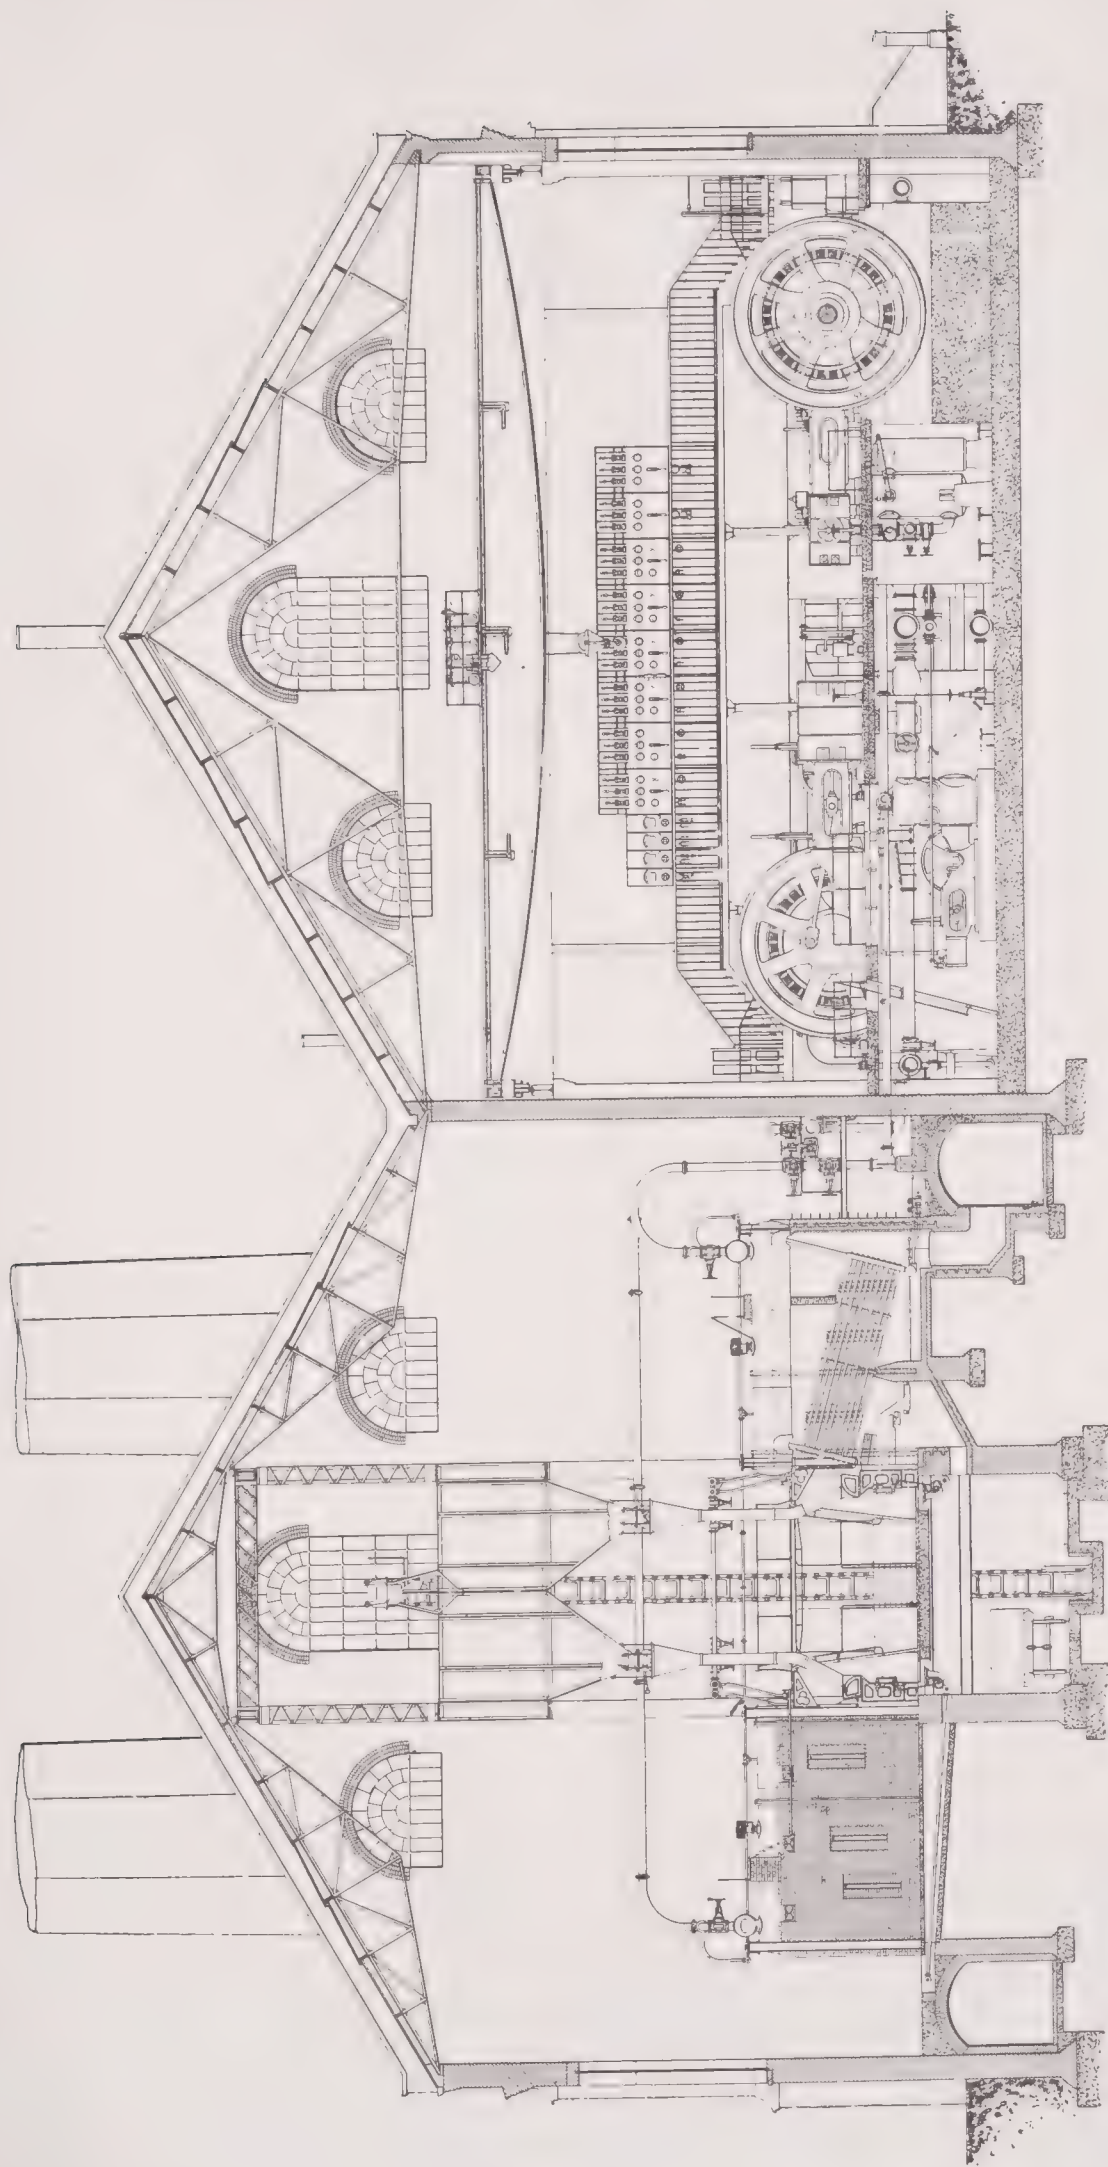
CENTRAL LONDON RAILWAY: CROSS-SECTION OF POWER STATION.
